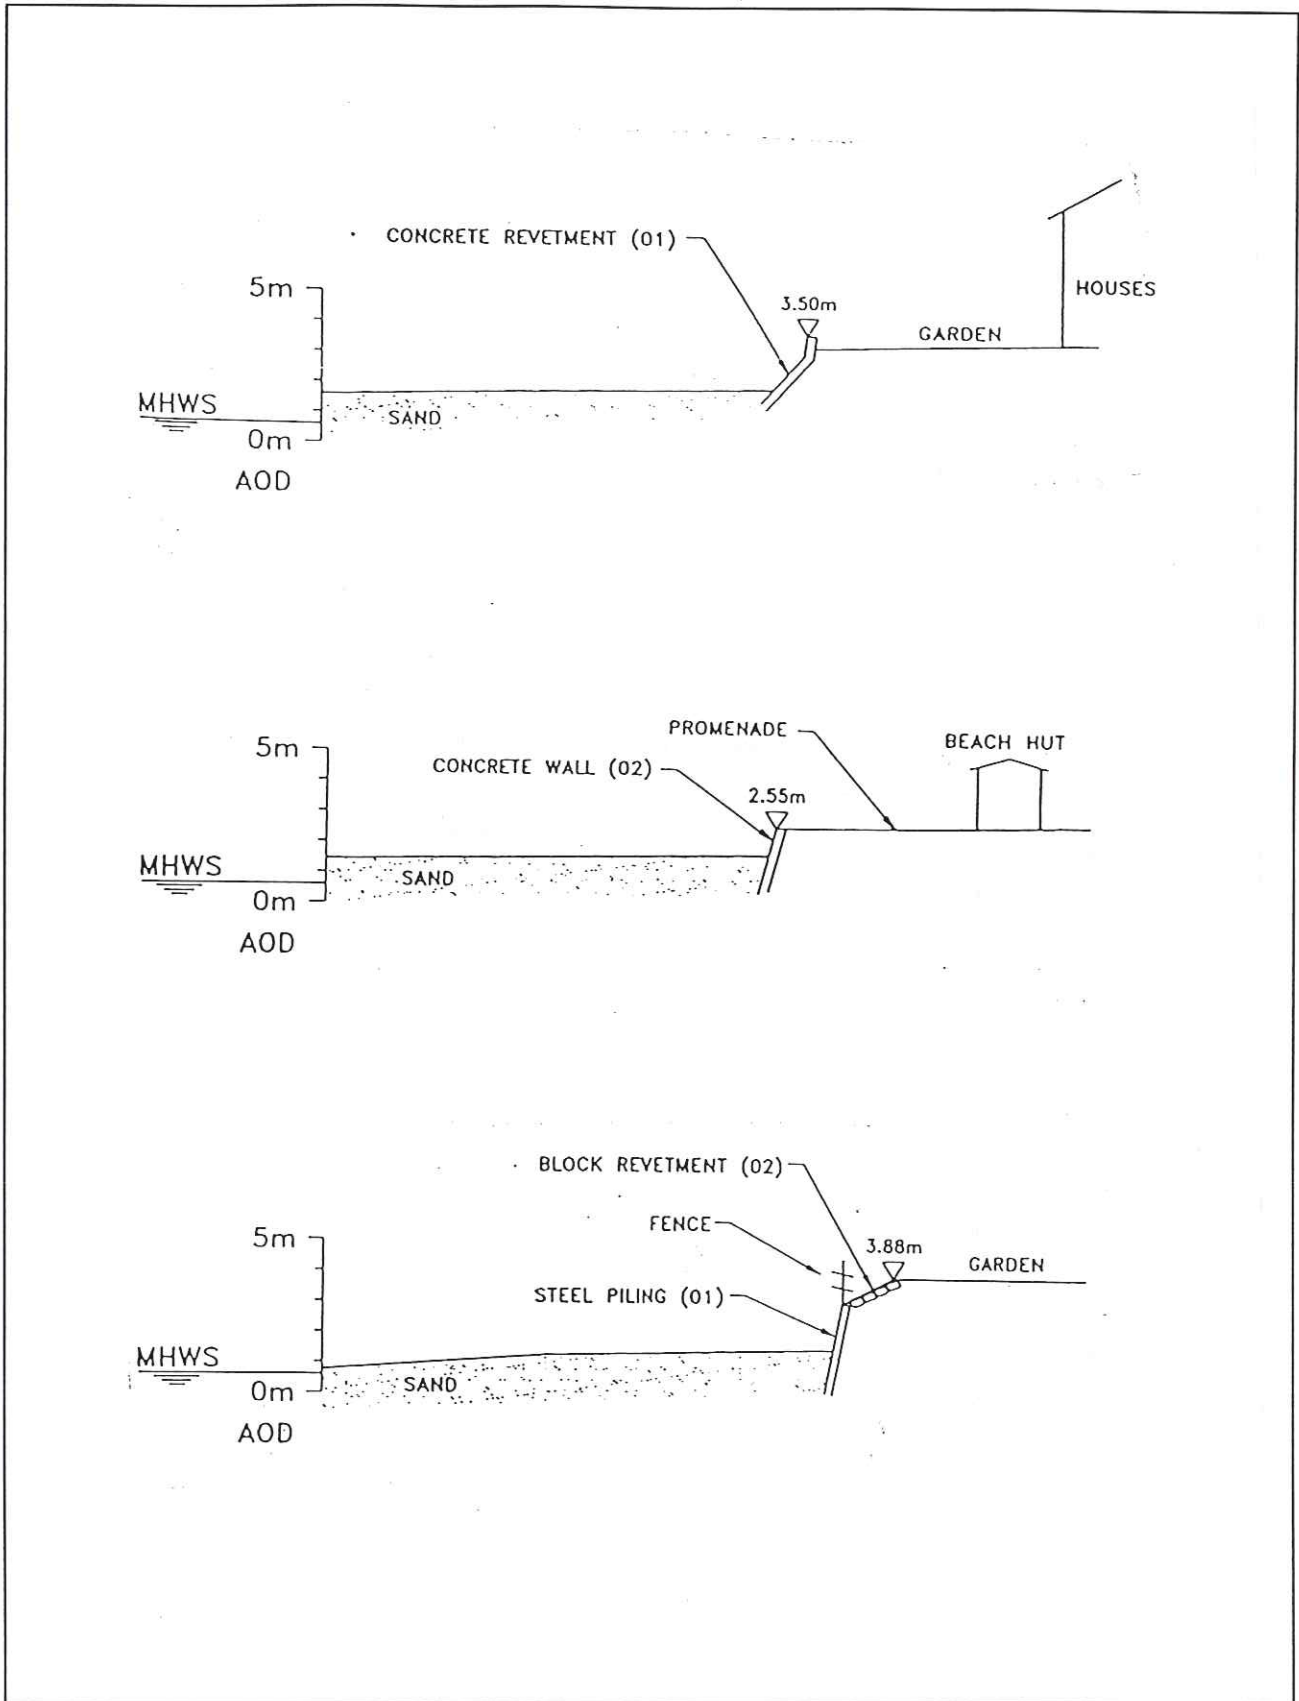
Seawall cross-sections 1/10, 1/11 and 1/14
